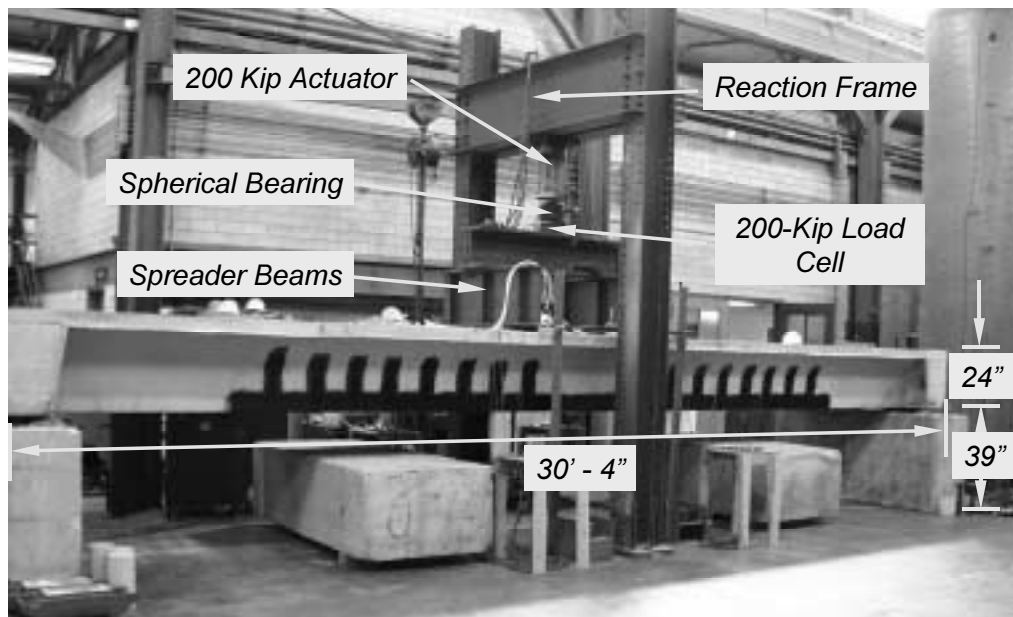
Side View of Pan-Girder Specimen in Laboratory Test Setup
